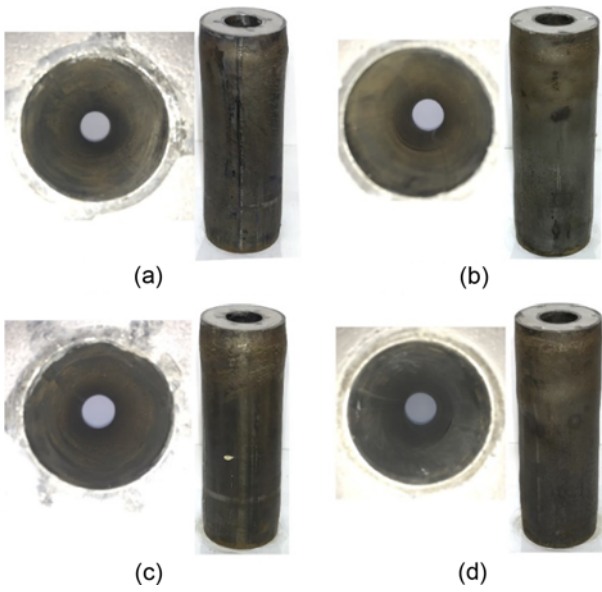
Failure Modes of: (a) 2-W60-4 Specimen, (b) 2-W114-4 Specimen, (c) 2-W60-6 Specimen, (d) 2-W114-6 Specimen
